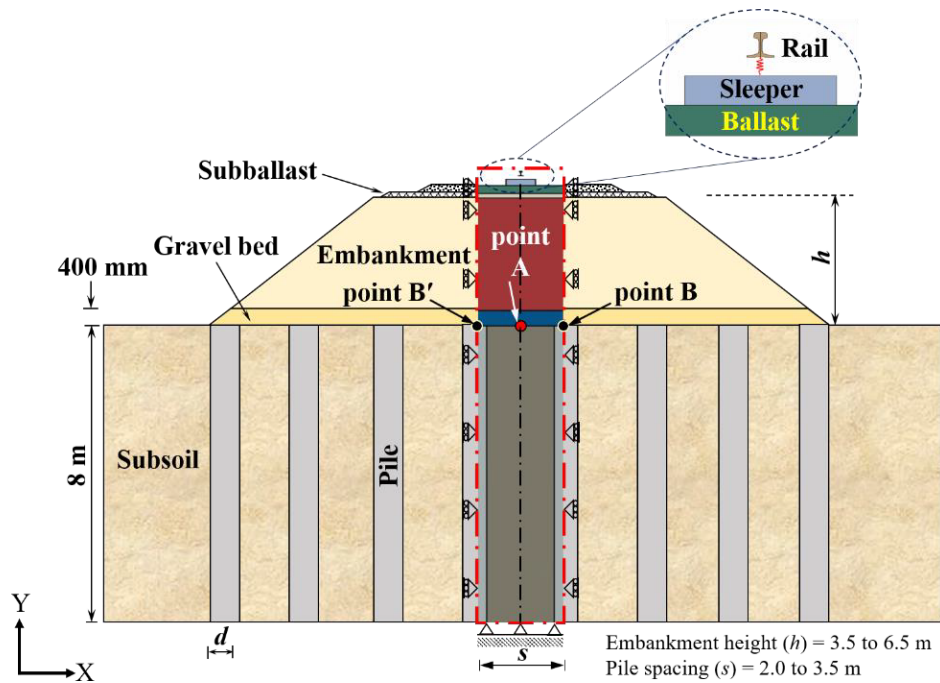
A typical cross section of pile-supported embankment including FE simulated model
